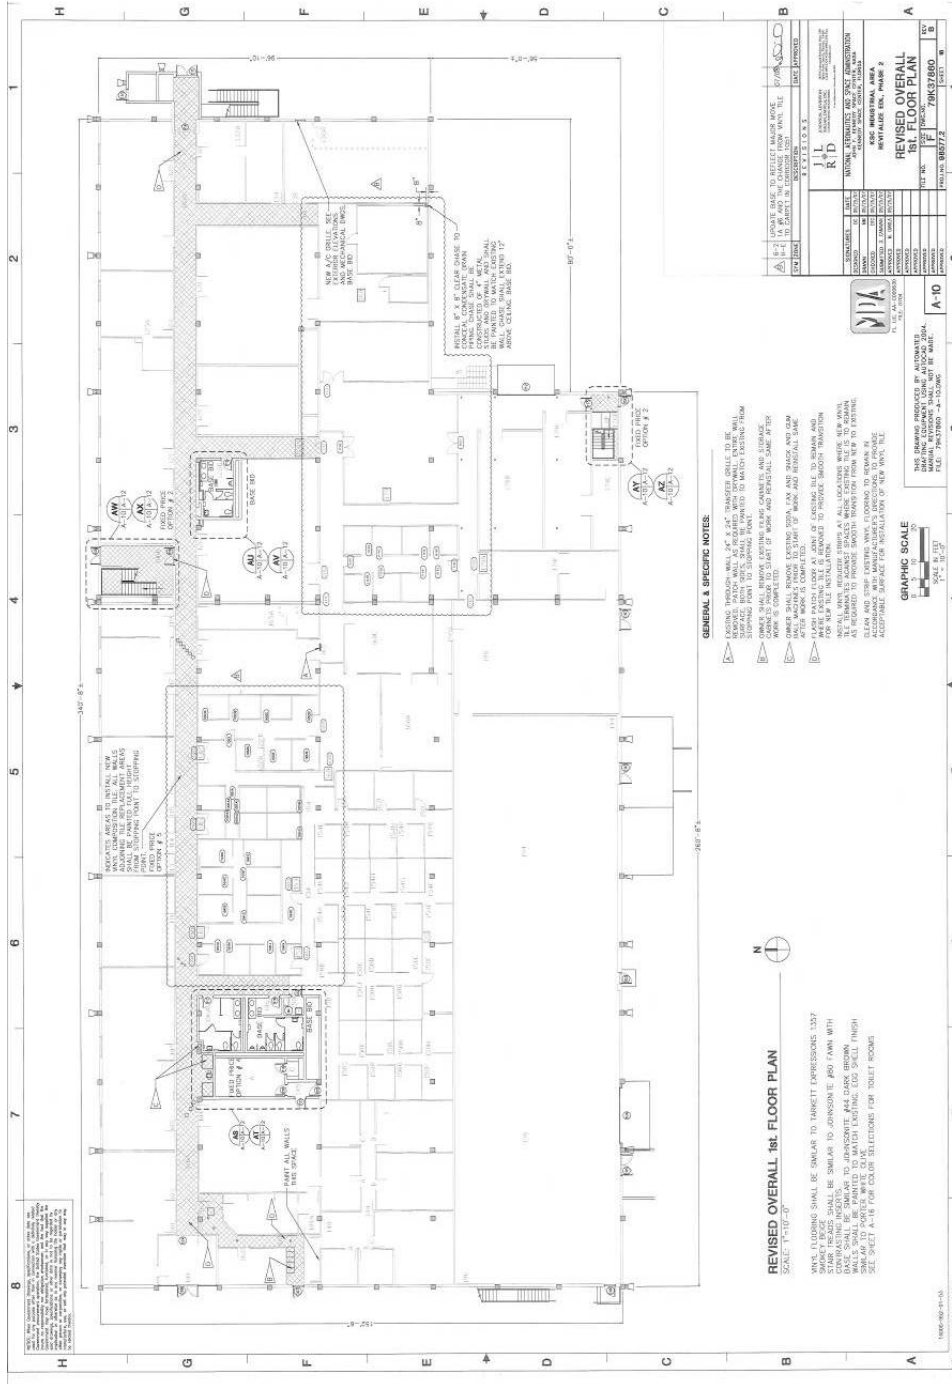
Johnson, Levinson, Ragan, Davila Inc., Revitalize EDL, Phase 2, 1st Floor Plan, September 2007, Sheet 16.
